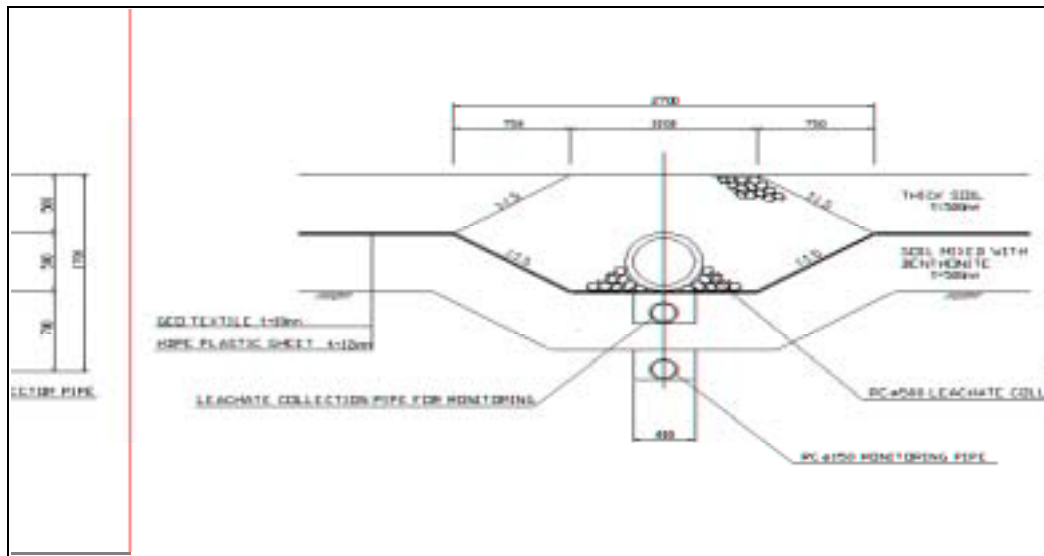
Cross Section of Leachate Collection Pipe
